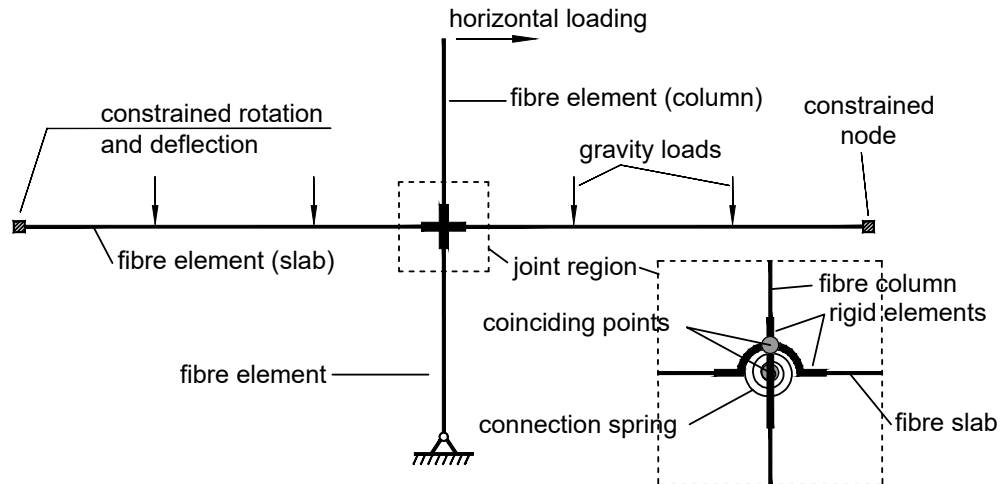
Adopted model for the specimens and the flat slab-column connections
